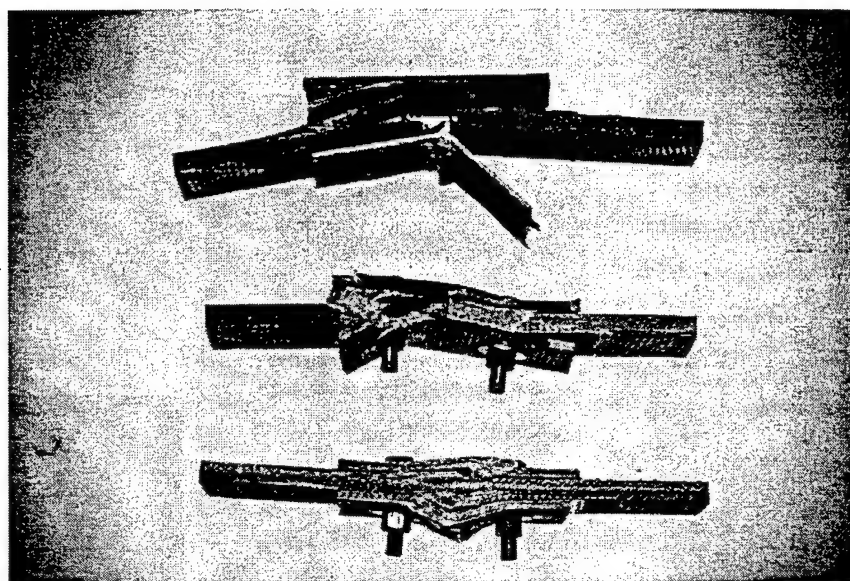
Two Views of the Tensile Strength Bolted Joint after Failure
